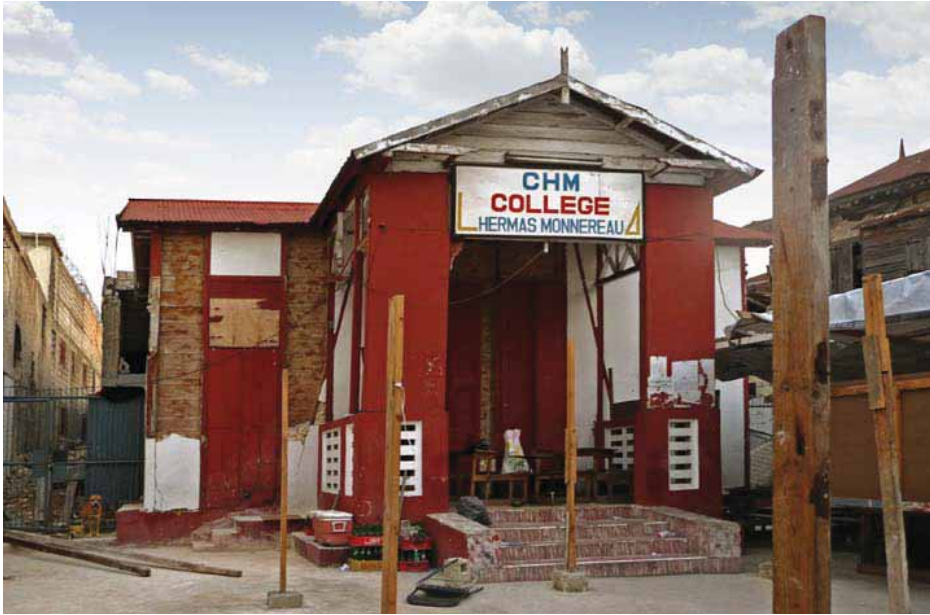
A small *colombage* school building at 16 Lamartiniere that had a two-story addition behind it. Large portions of this addition collapsed completely, but the original building is still intact and in use.
